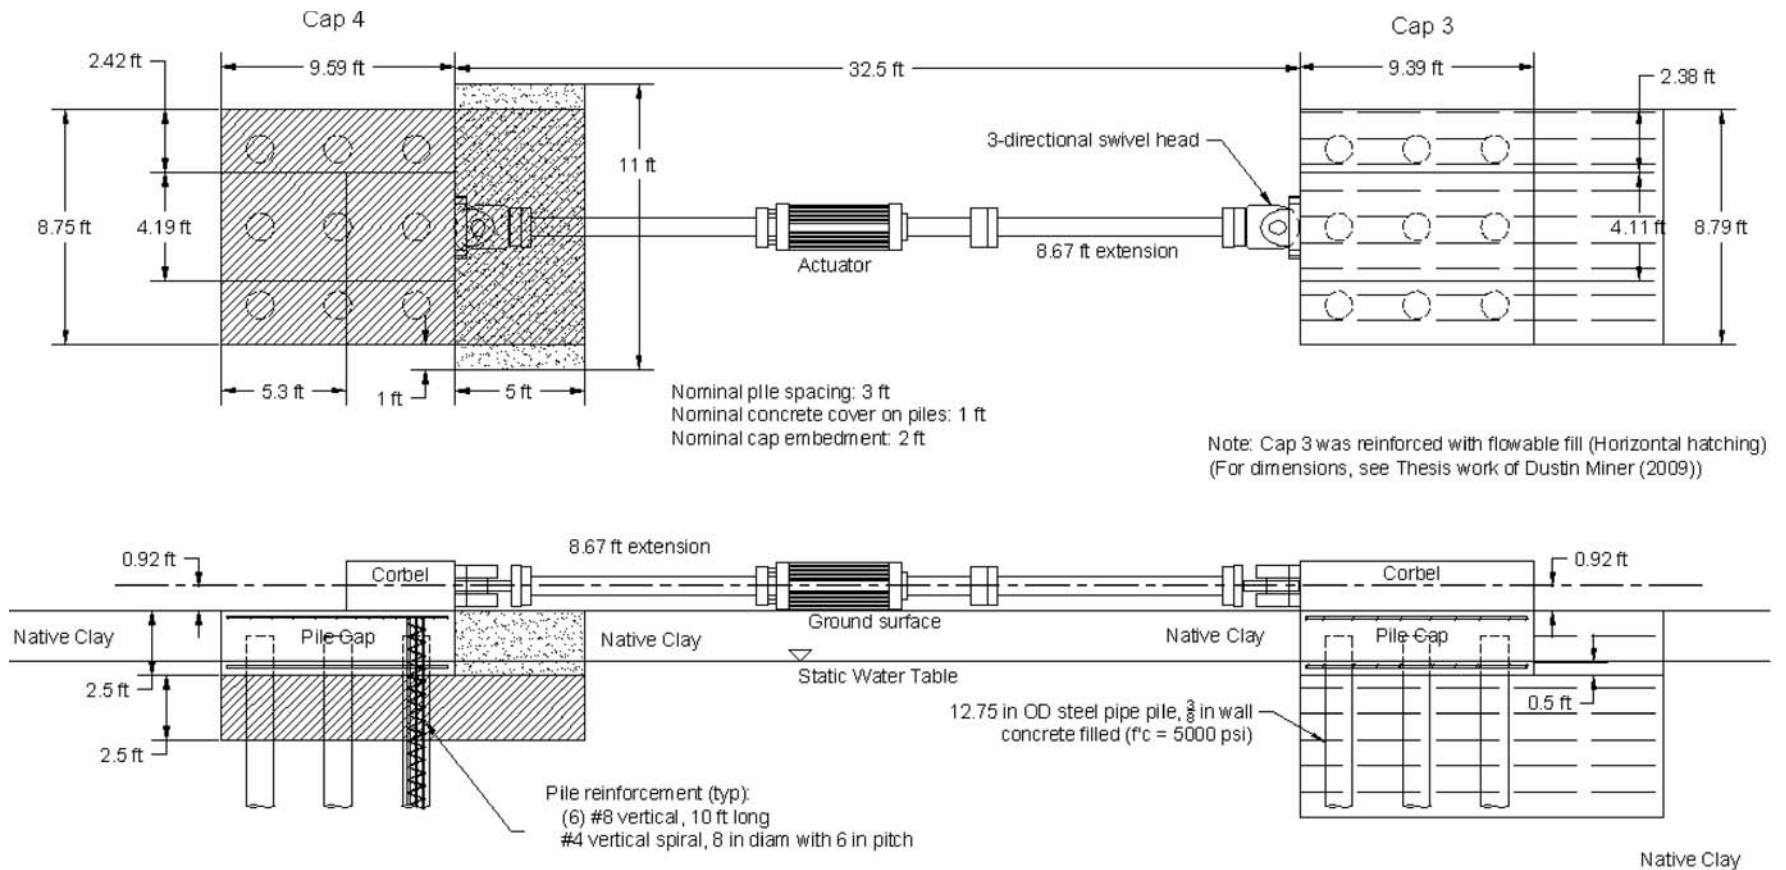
Plan and profile views of Pile Caps 3 and 4 after excavation and replacement with compacted fill around Pile Cap 4 and placement of flowable fill under Pile Cap 3.
